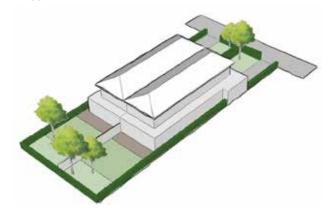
Dual occupancy constructed with the new 35% minimum garden area requirement
